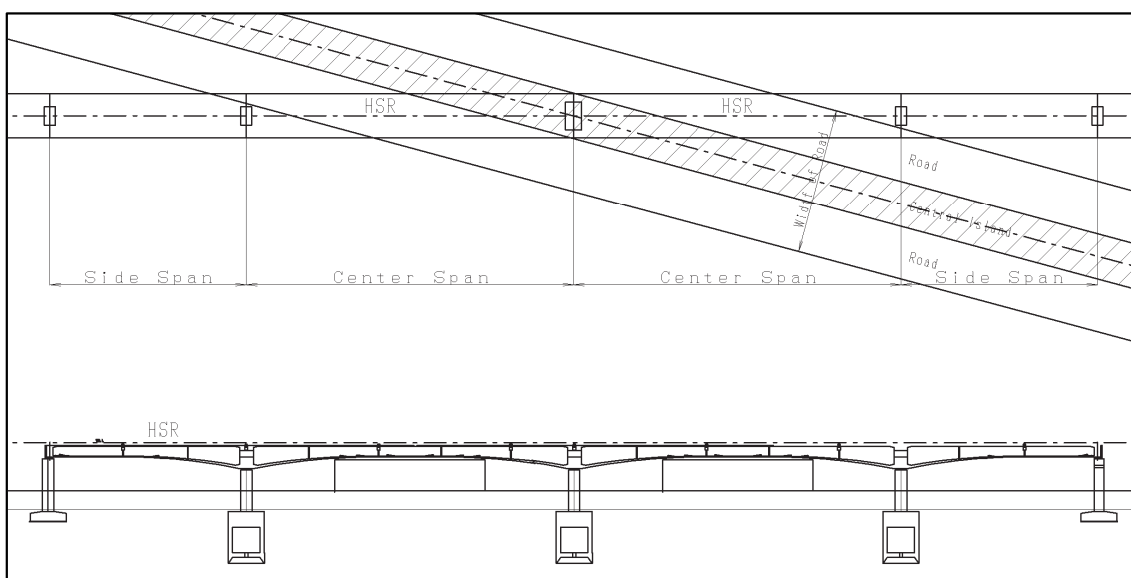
Bridge (PC-girder (Cantilever erection method))
